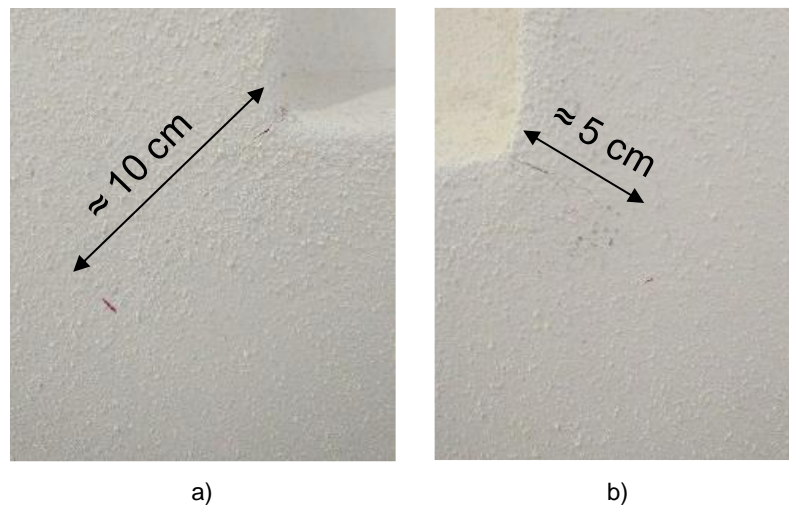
Cracks in the corners of the opening, using mineral coating: a) Bottom left corner; b) Bottom right corner.
